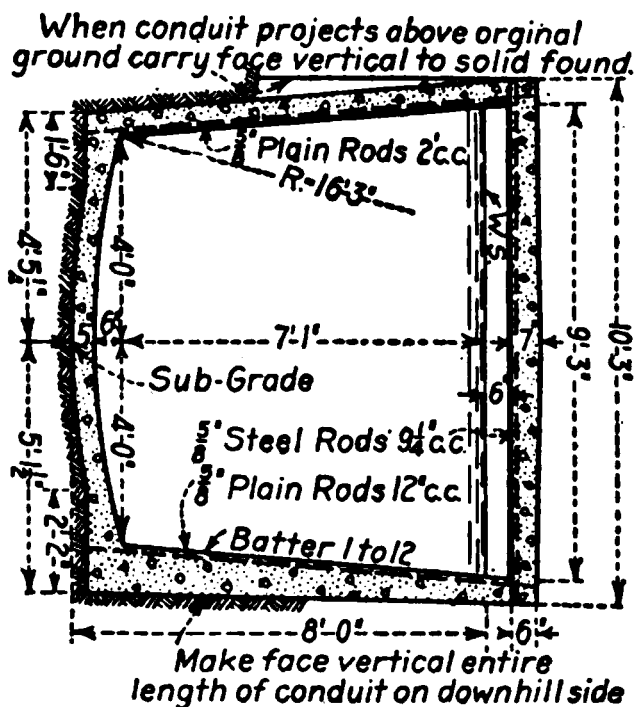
Closed conduit, Los Angeles City Trunk Line.
